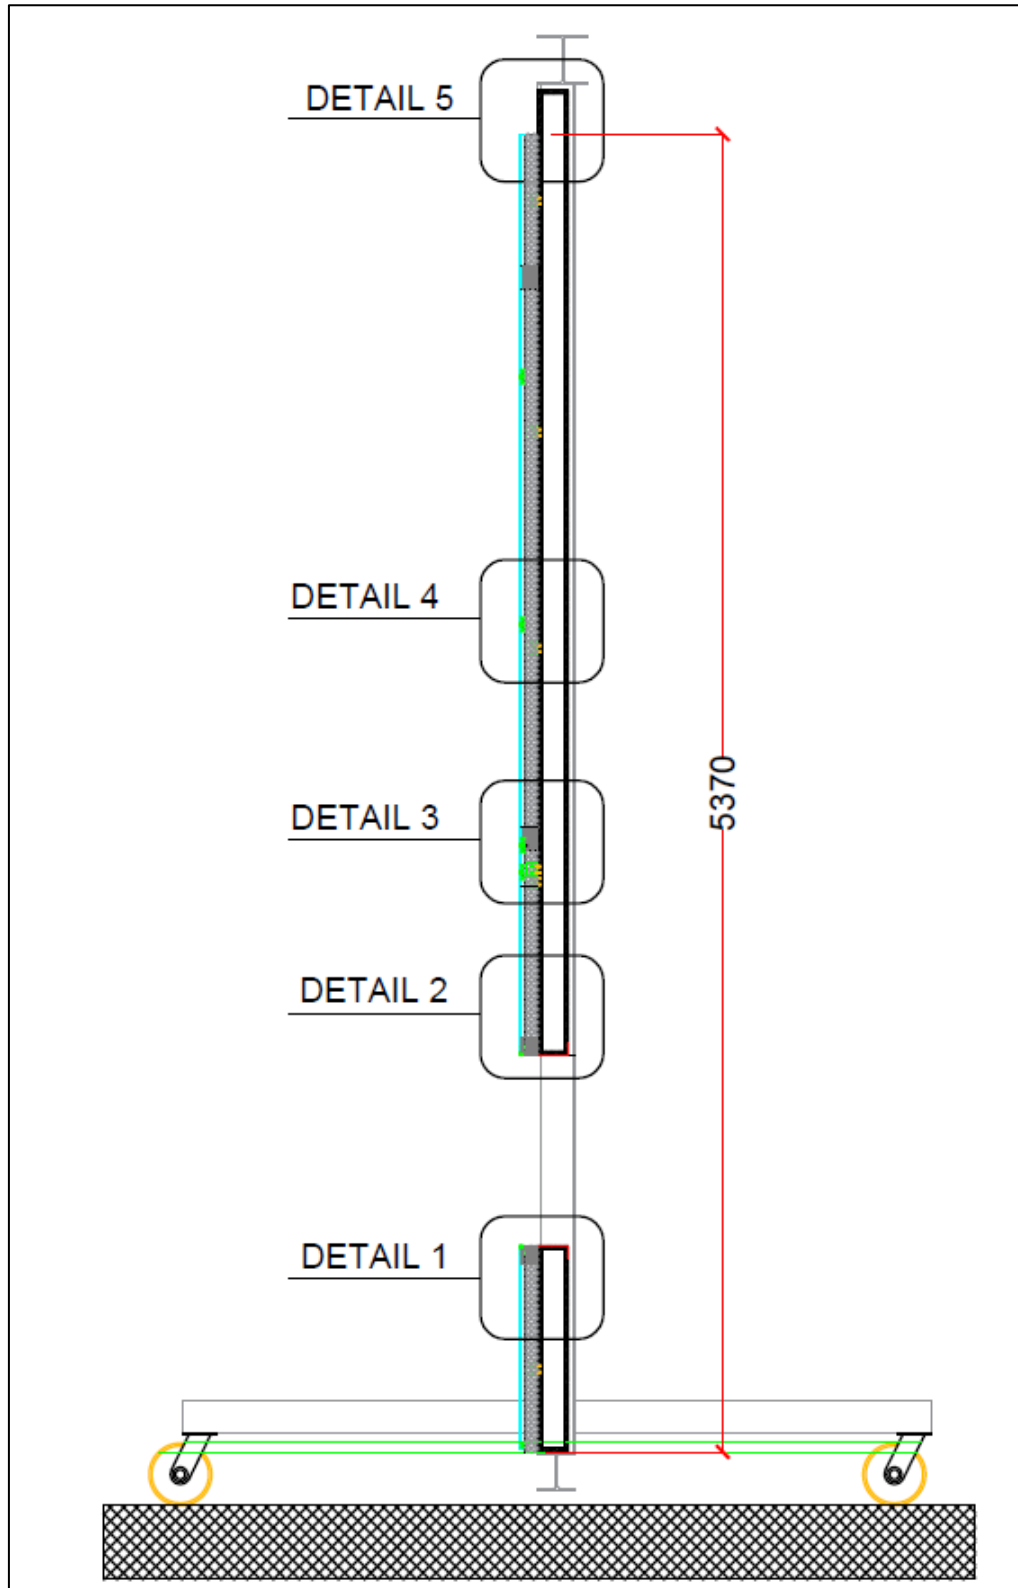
Elevation of the runners fixed onto the wall brackets.
